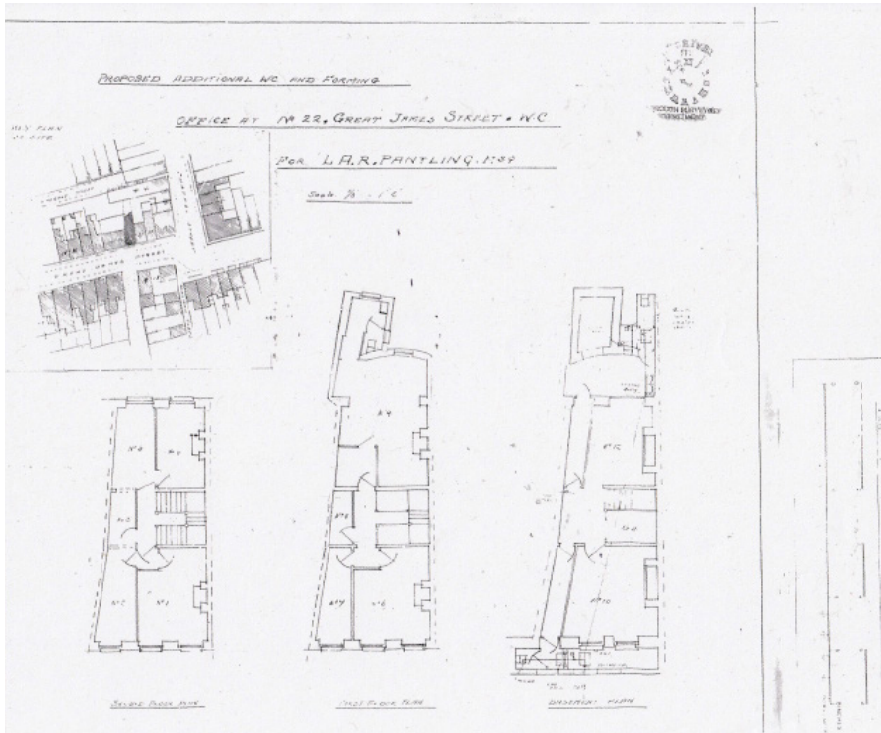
1959 Plan of No.22 showing the closet storey has been constructed (Source: Camden Local History Archives).
